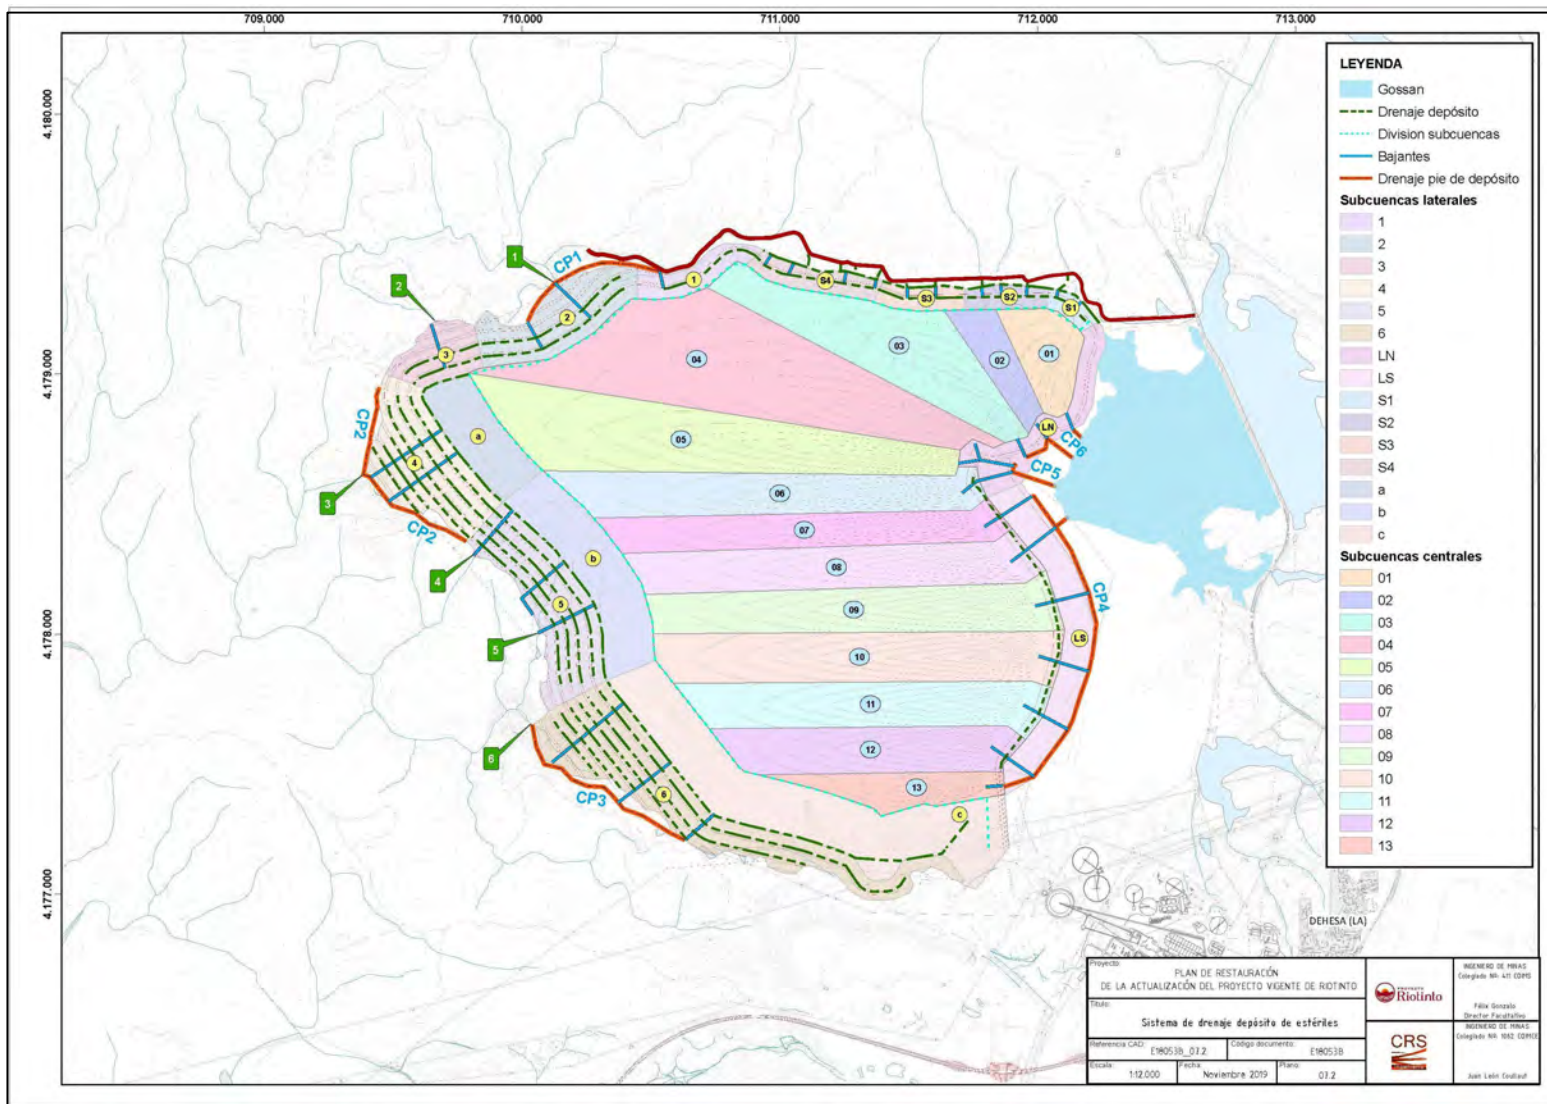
Conceptual Closure Plan – Surface Drainage (Eptisa, 2021).
